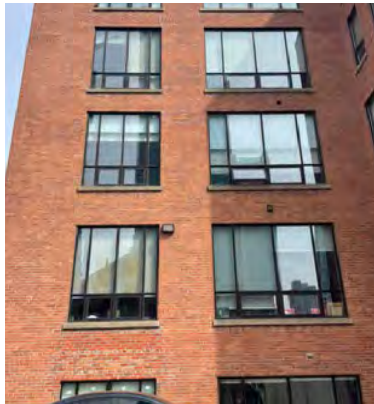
Typical condition of windows at exterior (ERA, 2022).
